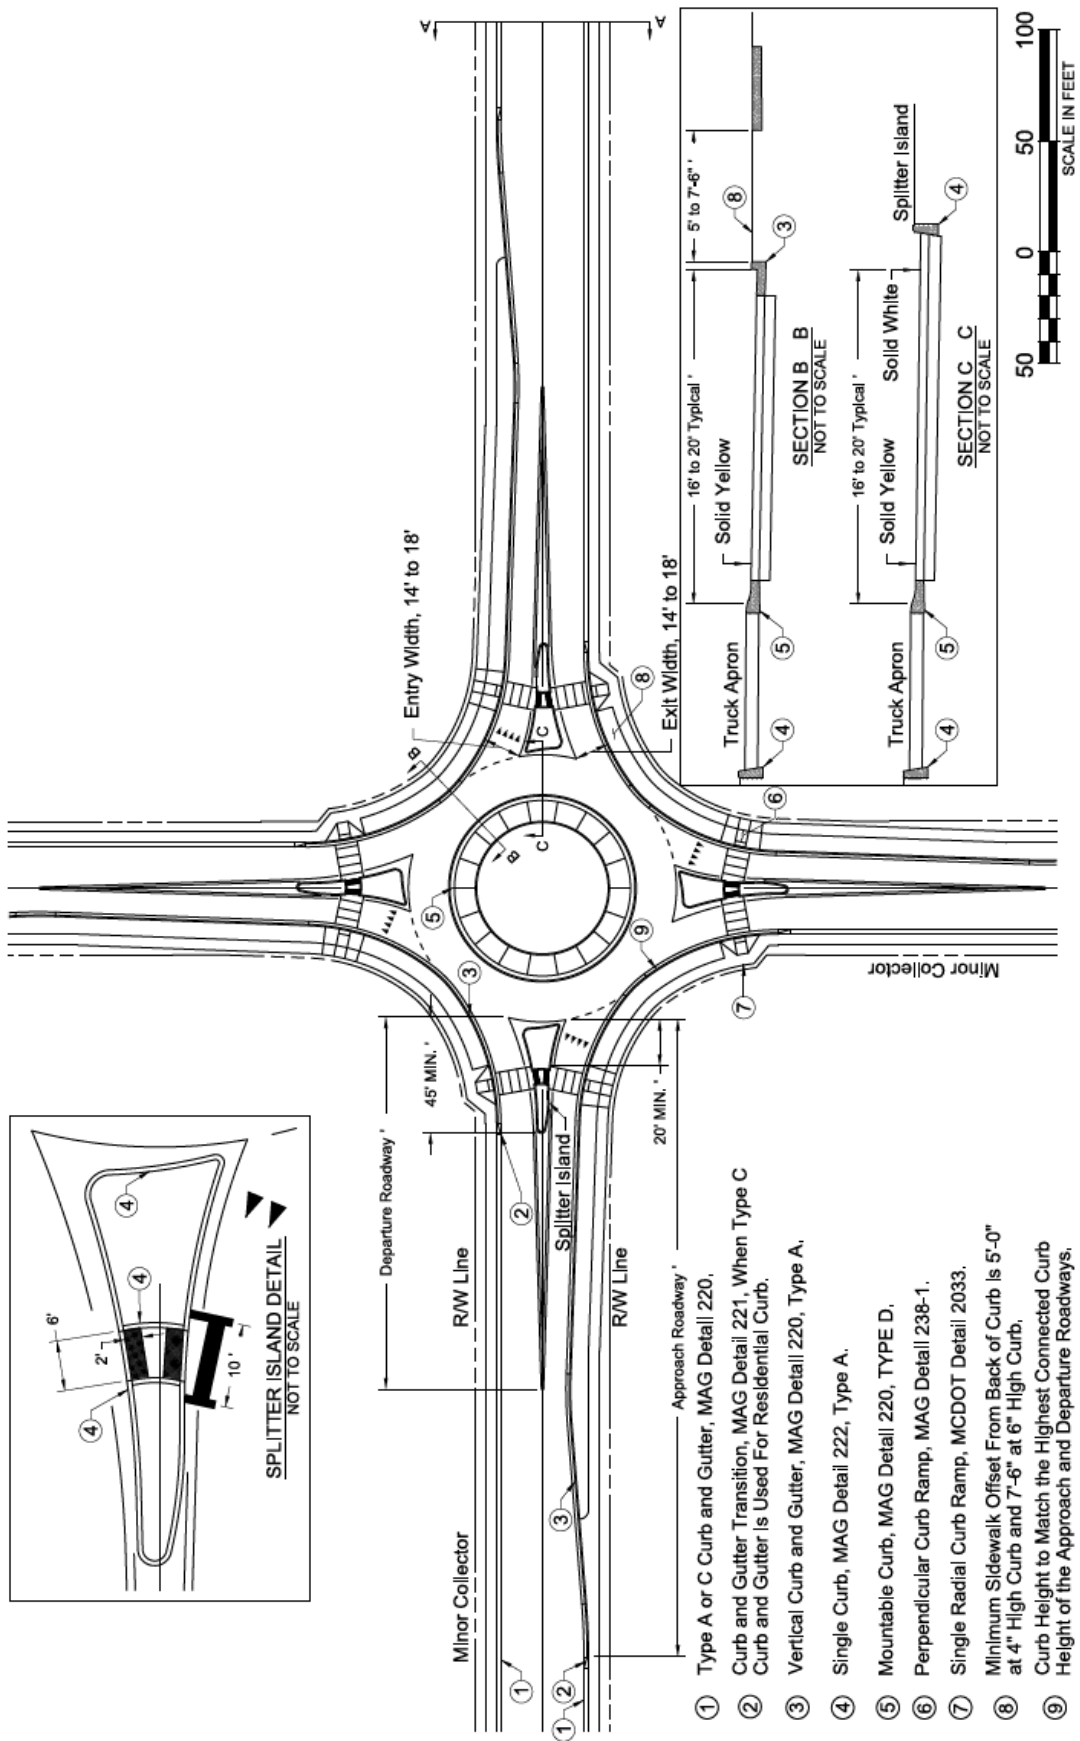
5: URBAN SINGLE-LANE ROUNDABOUT
